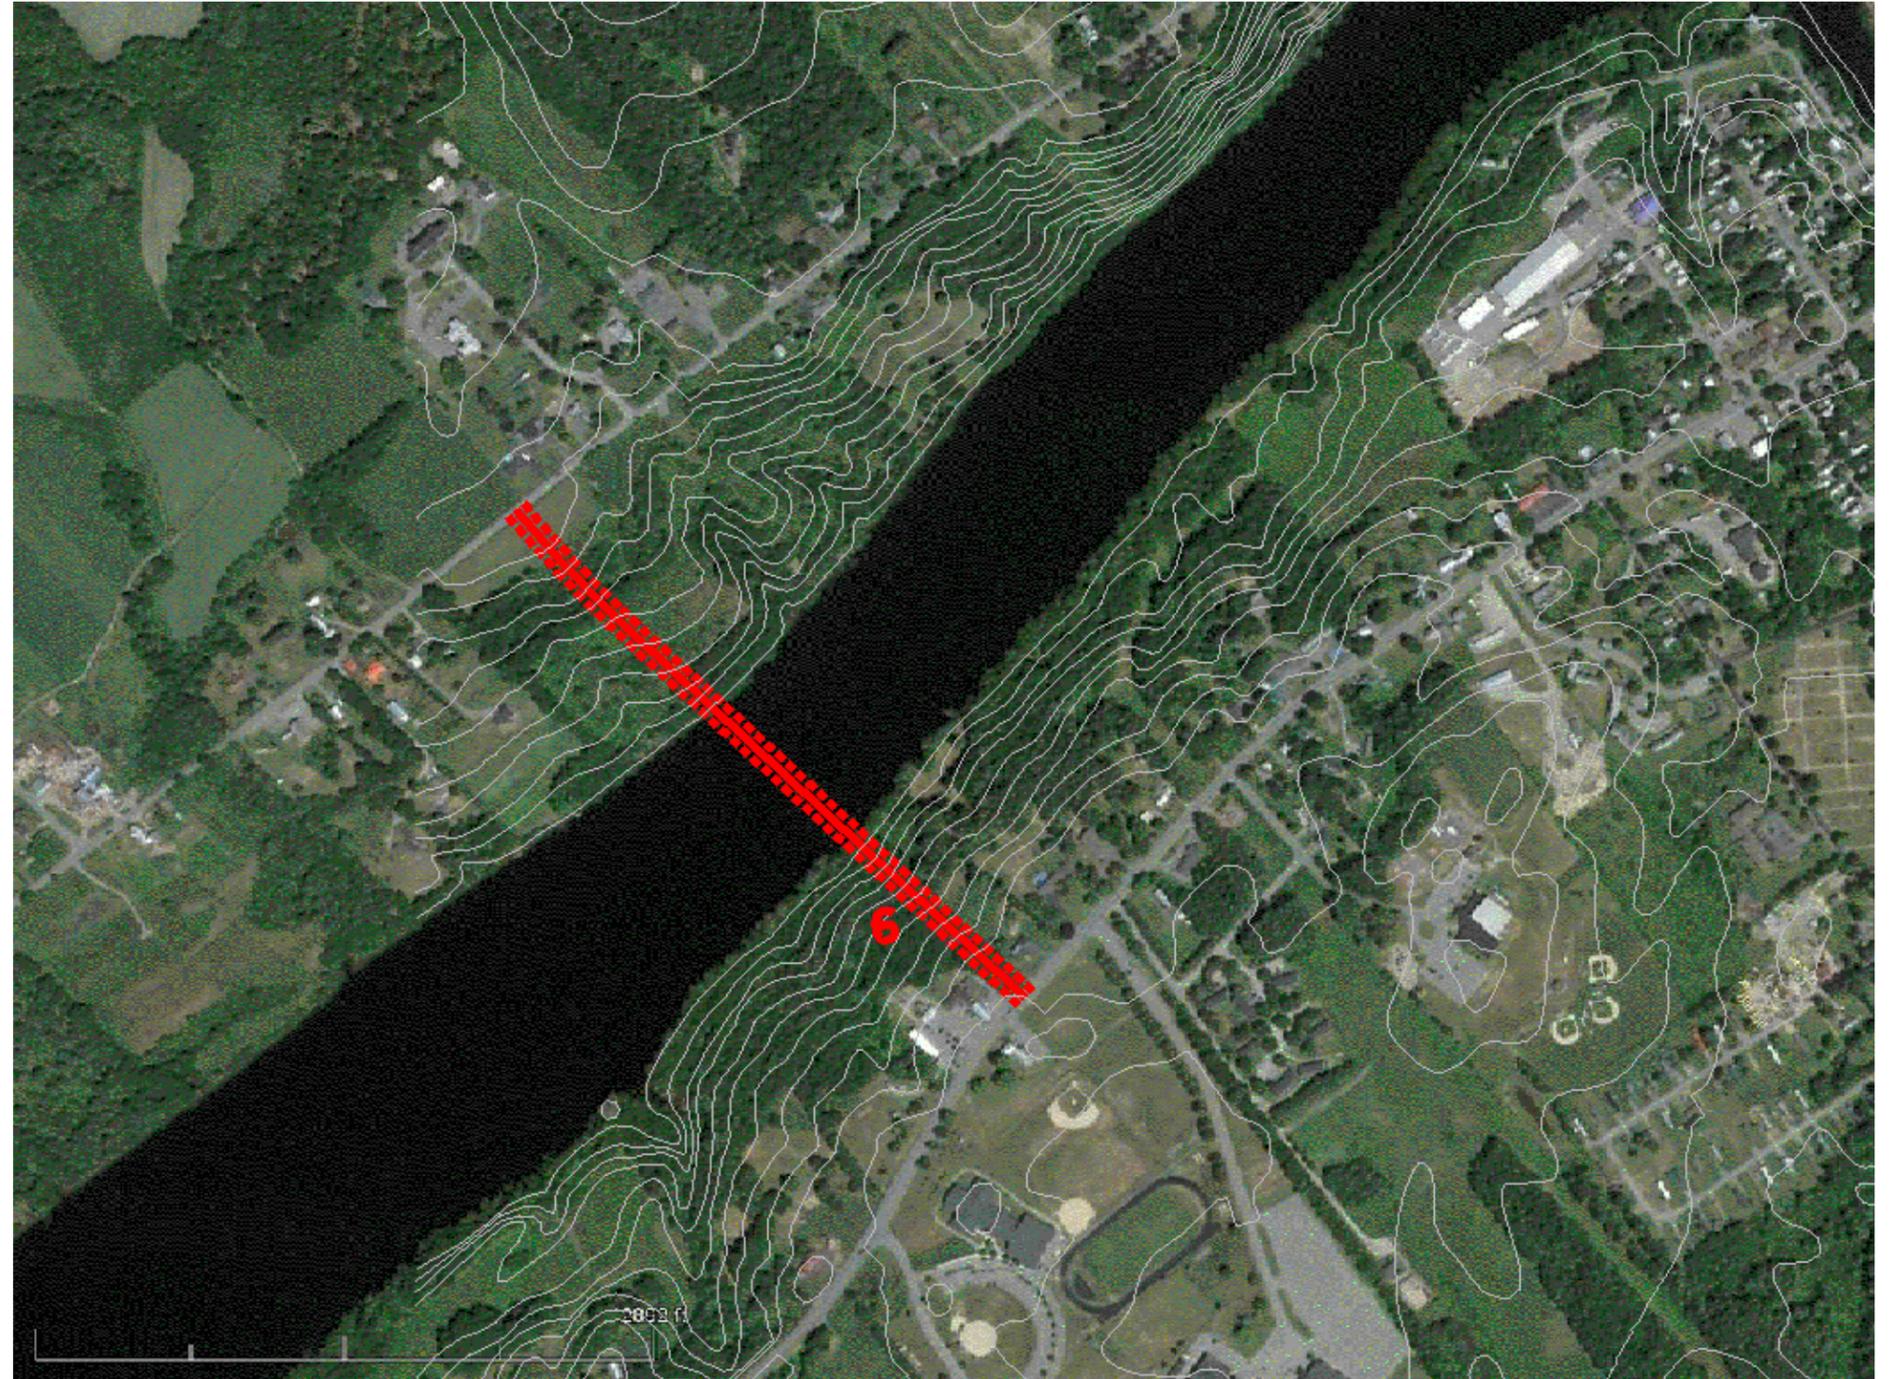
A6 Upstream Bridge Crossing Concept
